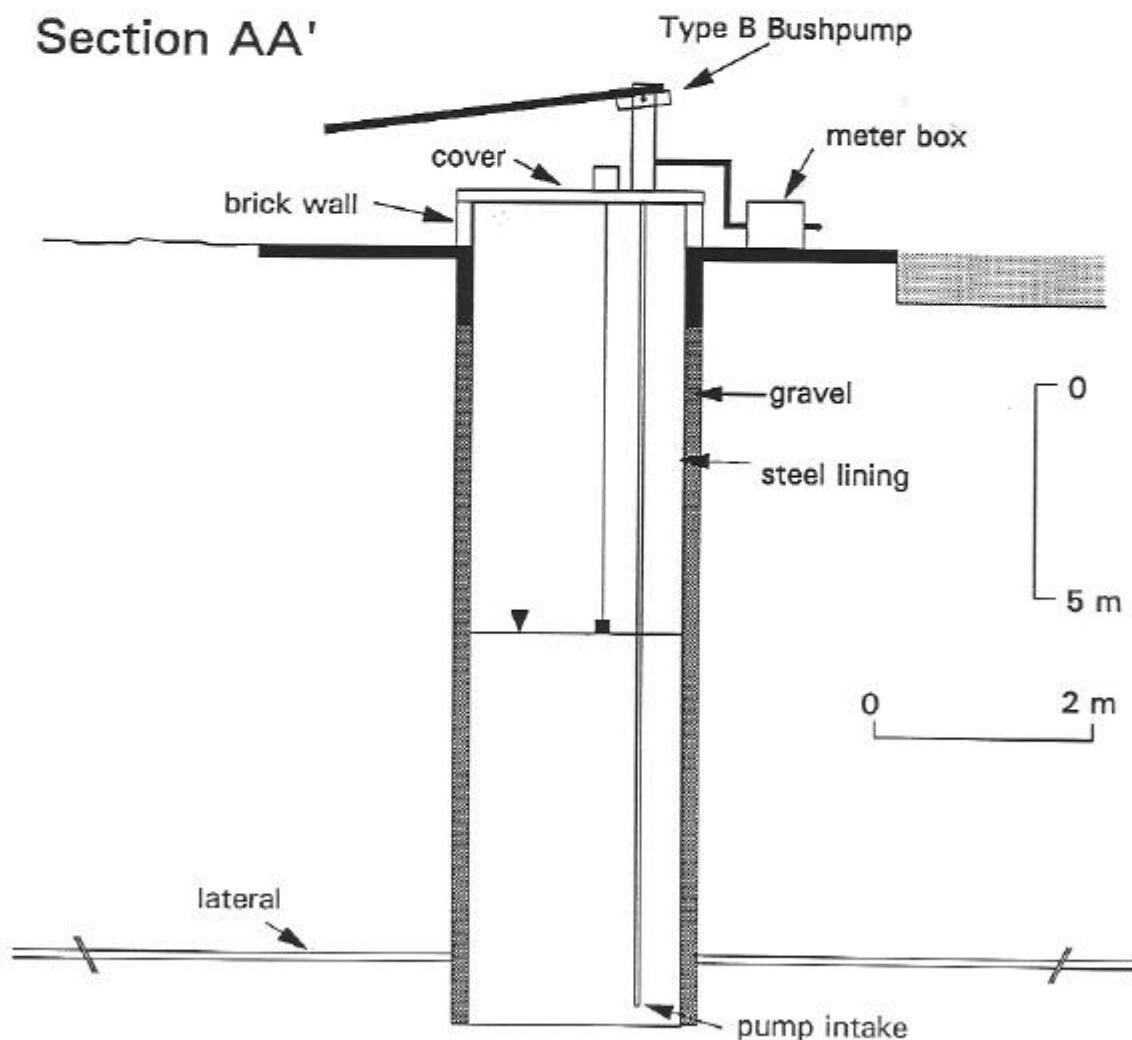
Collector well and headworks construction, site 8, Masekesa
